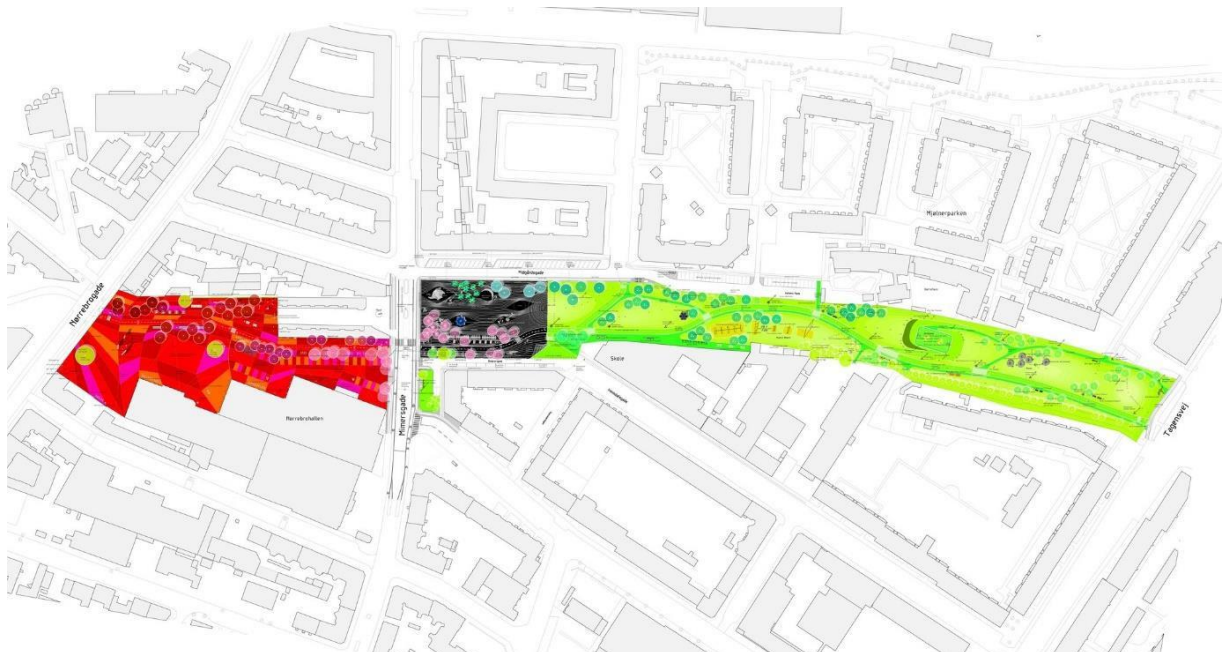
The plan of Superkilen Park showing the 3 zones; Green, Black and Red. (Source: Archdaily)
